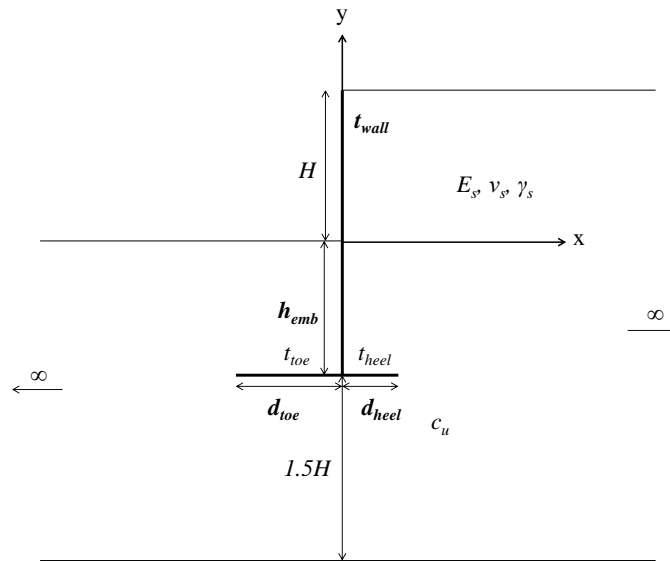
Cantilever reinforced concrete retaining wall model.
